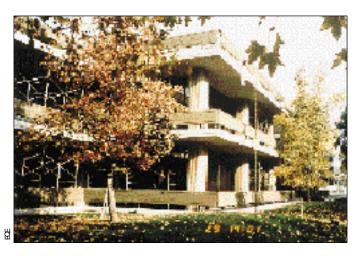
This building in Santa Clarita is shown during its 1993 retrofit which was undertaken with minimal disruption to its occupants. The building emerged from the Northridge earthquake with no structural damage.
